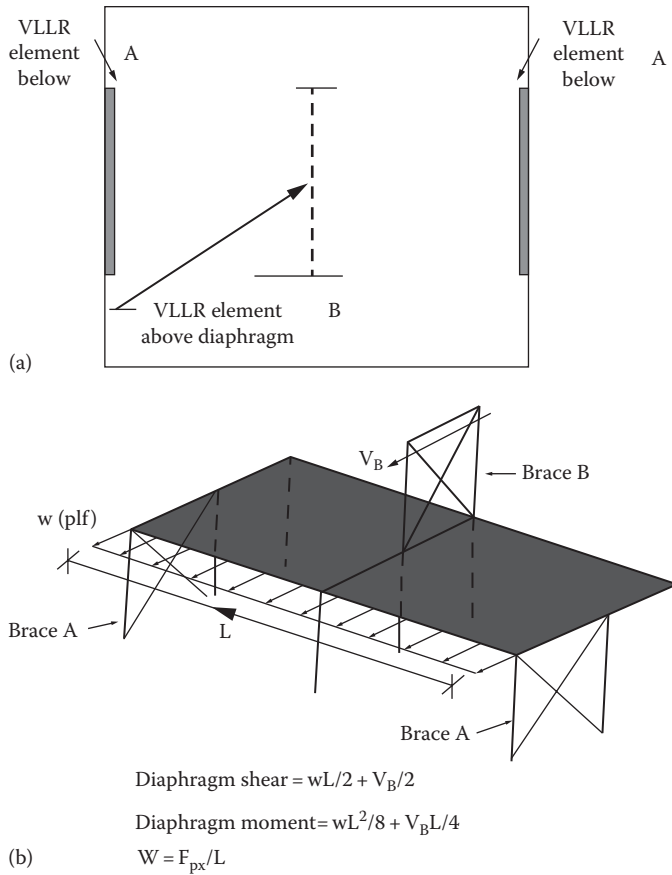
Transfer of VLLR element: (a) plan and (b) schematic elevation.
